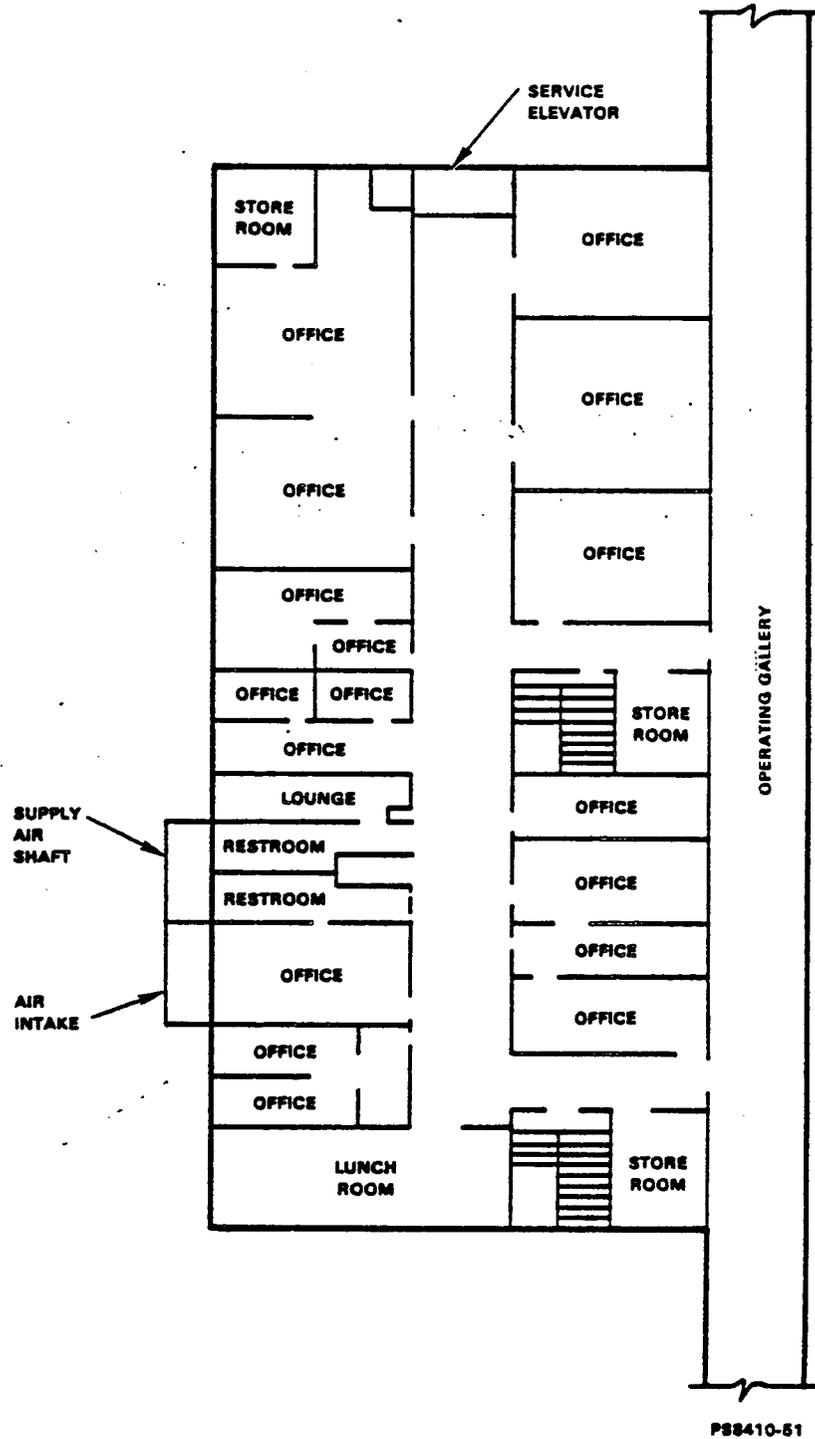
Building 271-T, Second Floor Layout.
